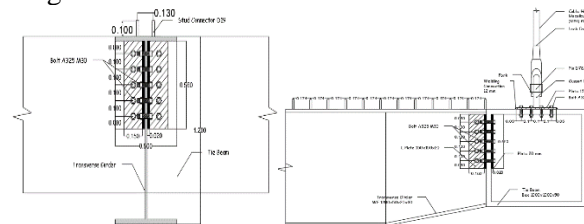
Detail Bolt Connection Transverse Girder to Tie Beam
